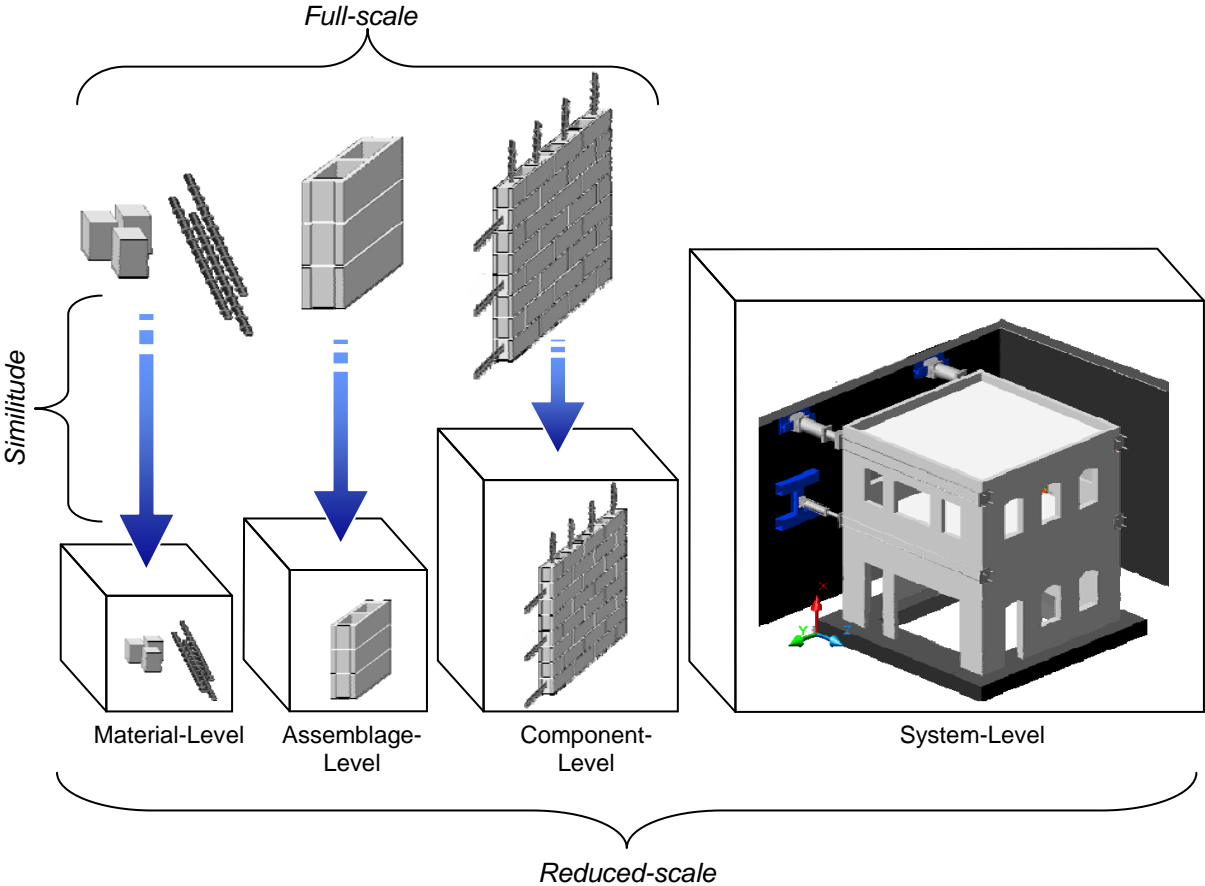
Overview of small-scale validation at the material-, assemblage-, and component-levels building to reduced scale experiments of complete masonry bearing-wall systems.
